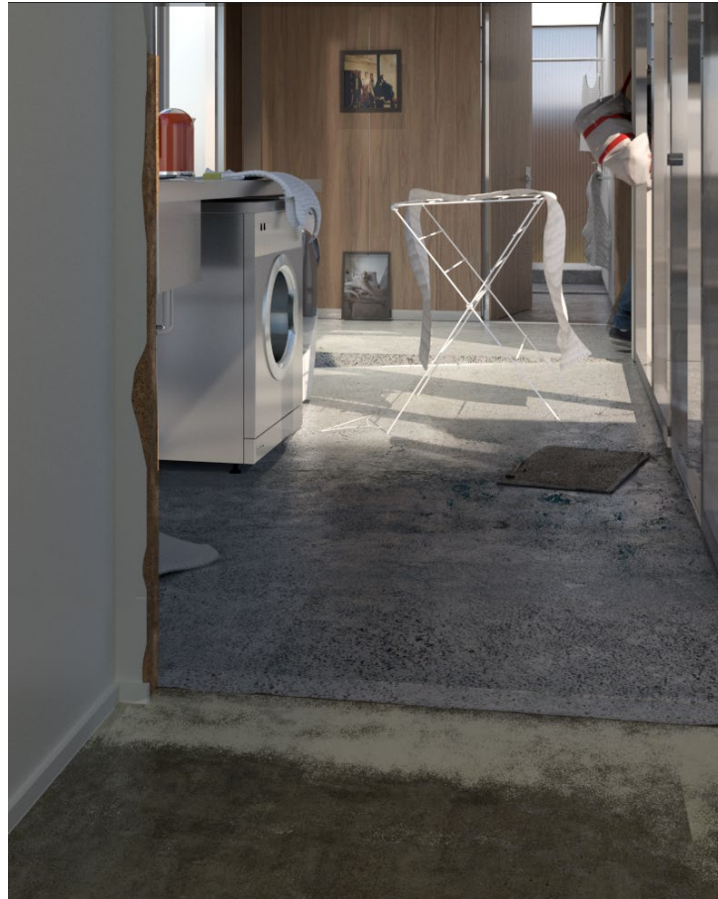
View towards proposed addition – water damage is revealed within the original slab
